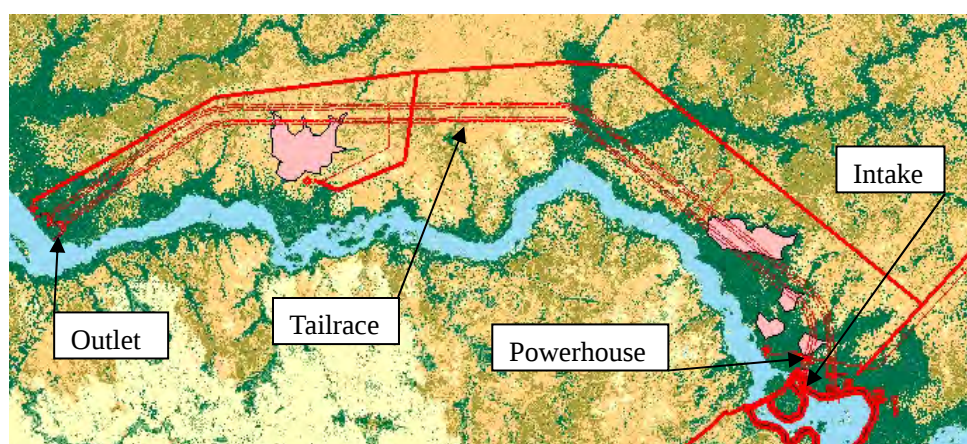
Alternative-3 at Ayago Site (Waterway Type, Right Bank Route)
